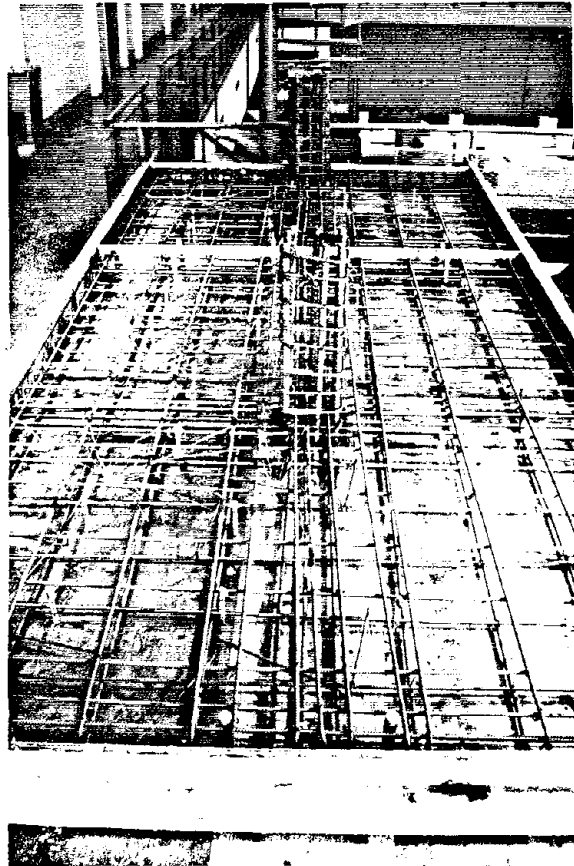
Specimen 8I and 9E - slab reinforcement
